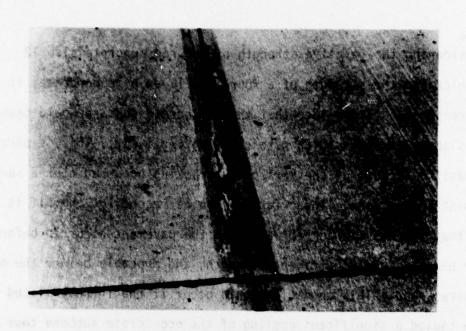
Cracking Distress Along Centerline Joint in Concrete Overlay, Shreveport
